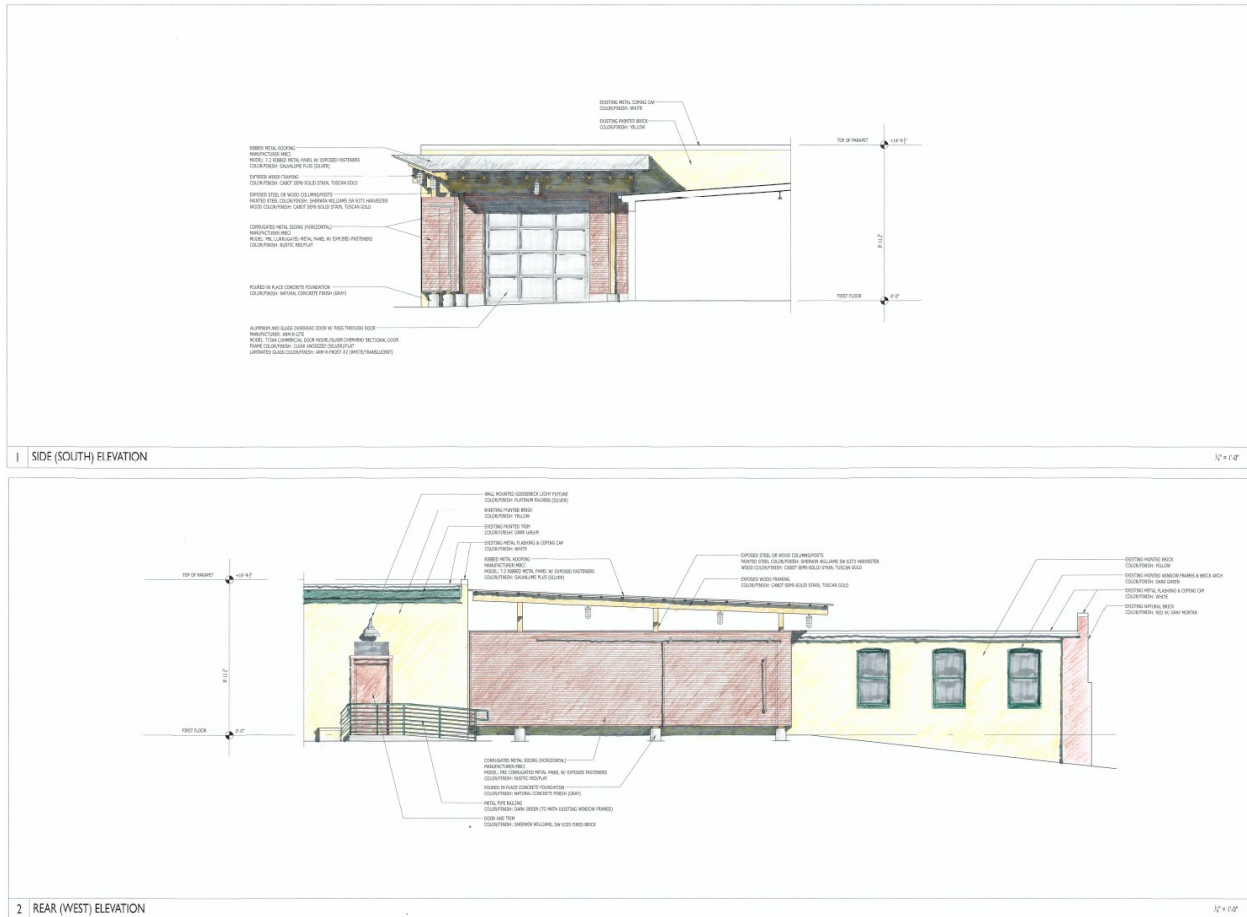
South and west elevation drawings for the rear addition at 841 Station Street approved under HPRB #19-20.
